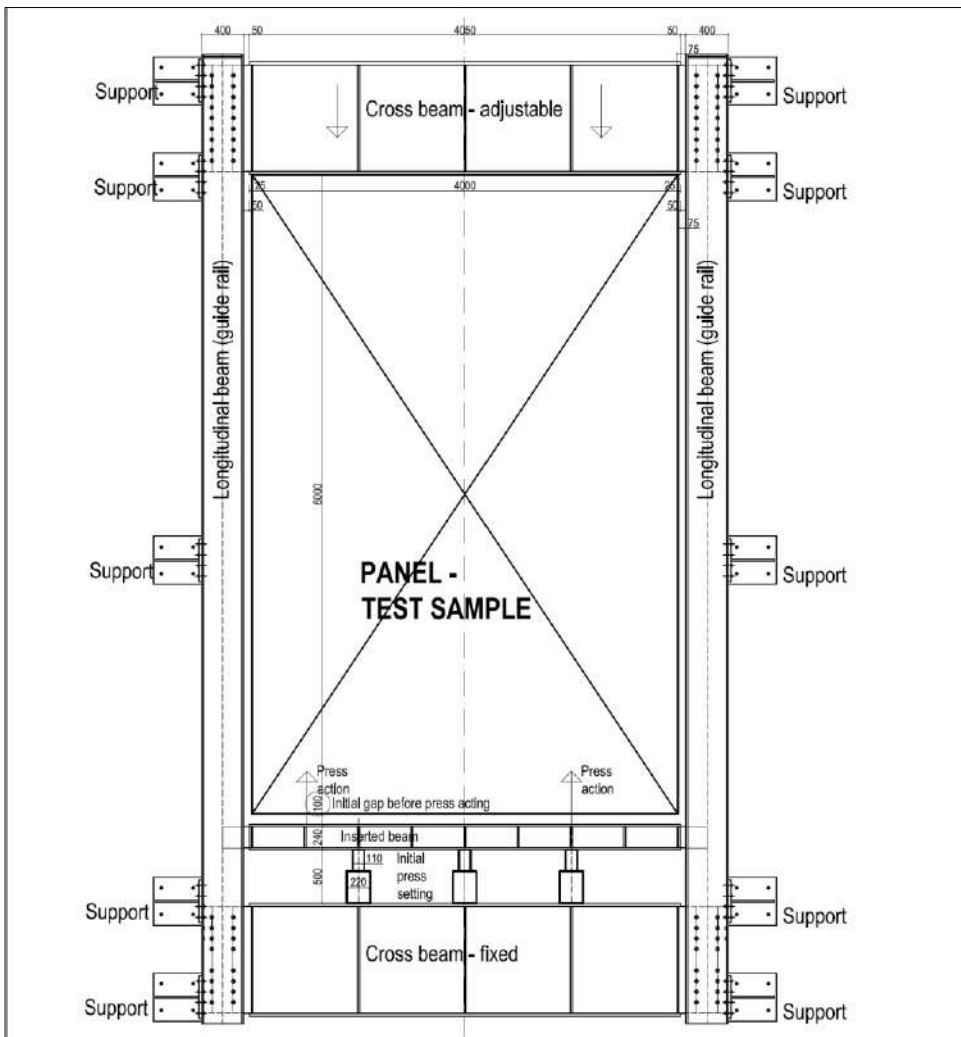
Functional scheme of the test frame structure, floor plan; dimensions in [mm]
